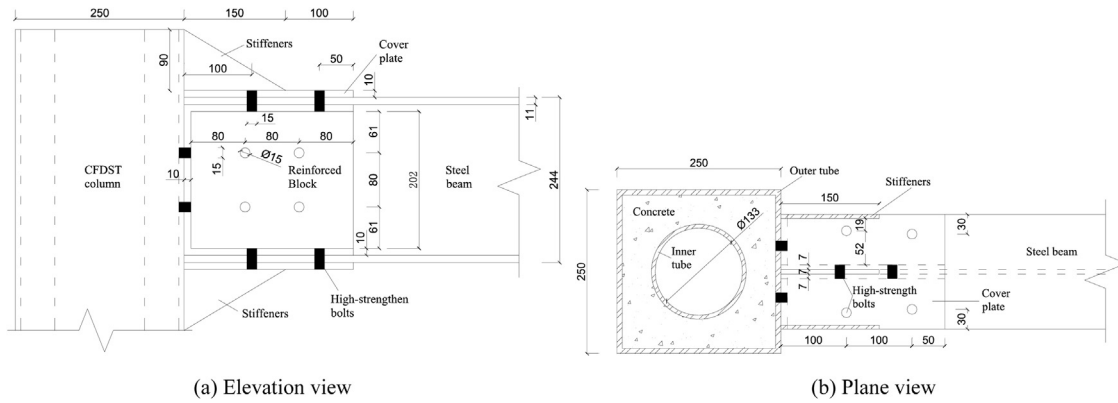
Dimensions of the beam-to-column connection (unit: mm).
